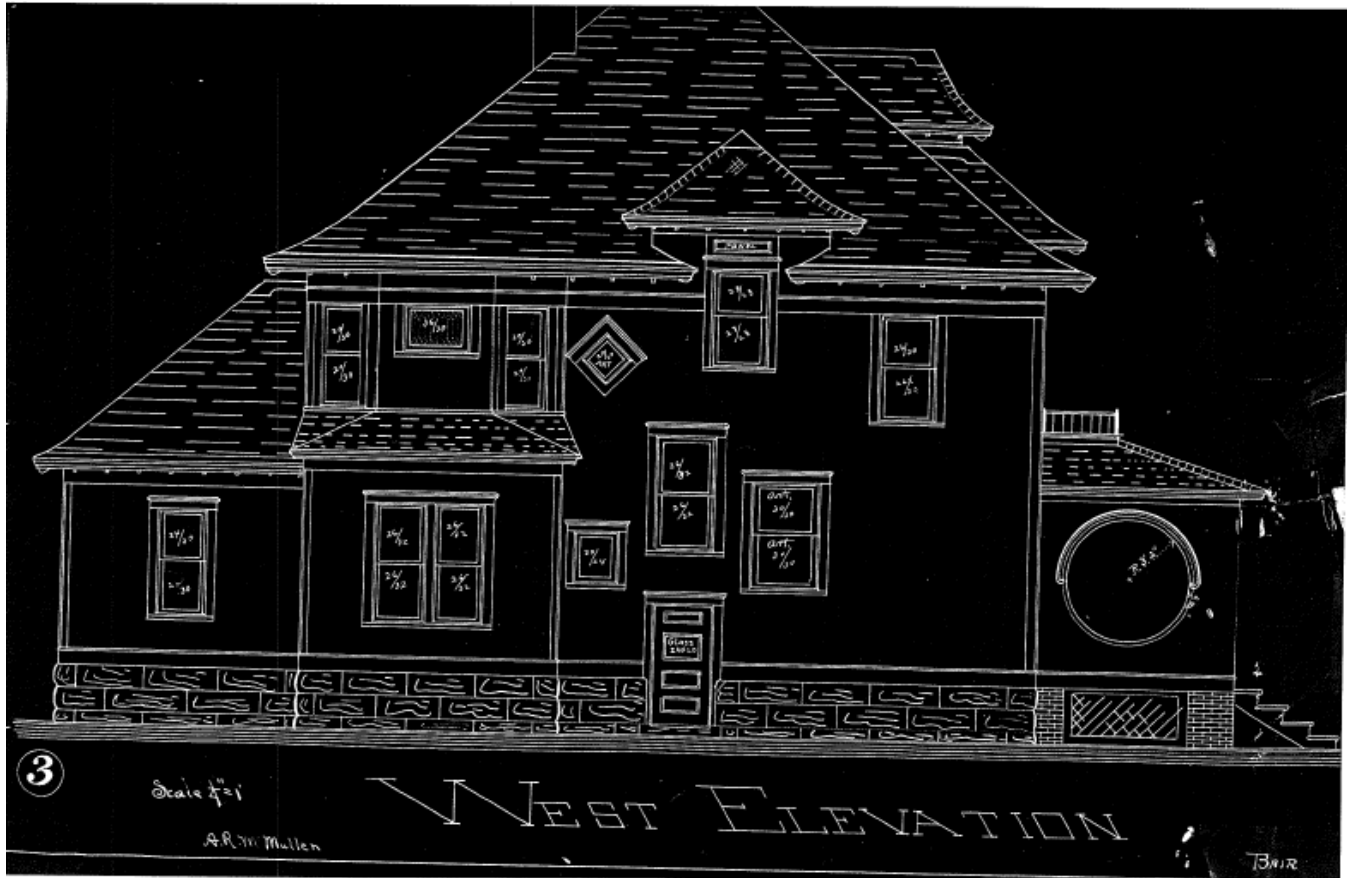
West elevation drawing, Moses N. Bair, 1904.
